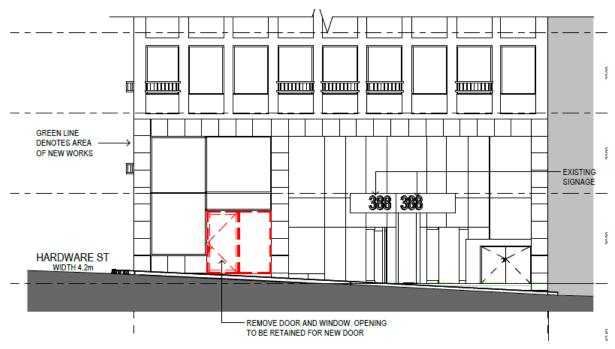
Proposed demolition at ground level of the Lonsdale Street elevation. From Drawing TP06
